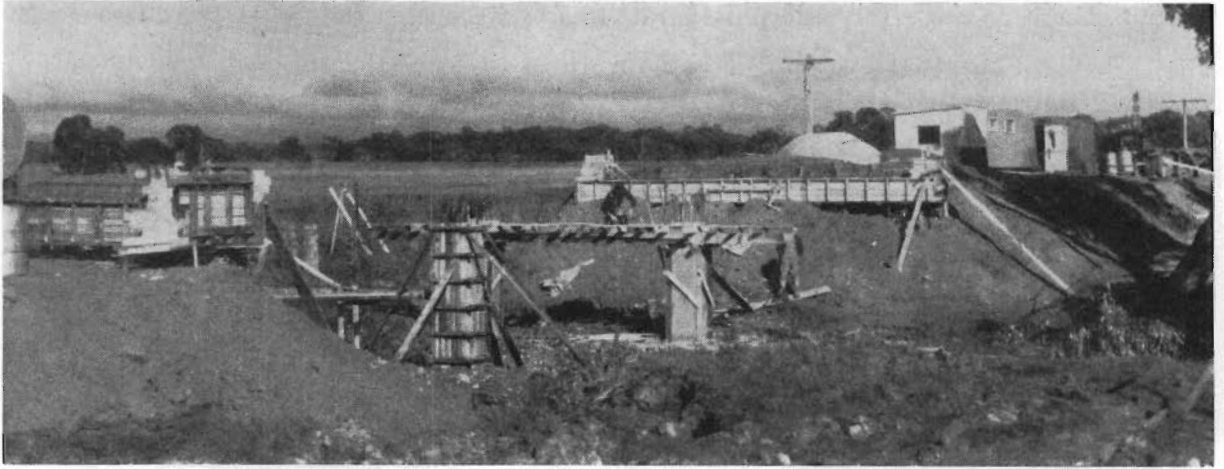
St. Arnaud-Dunolly Road—Replacement of Pyke's Bridge—Bet Bet Shire.
